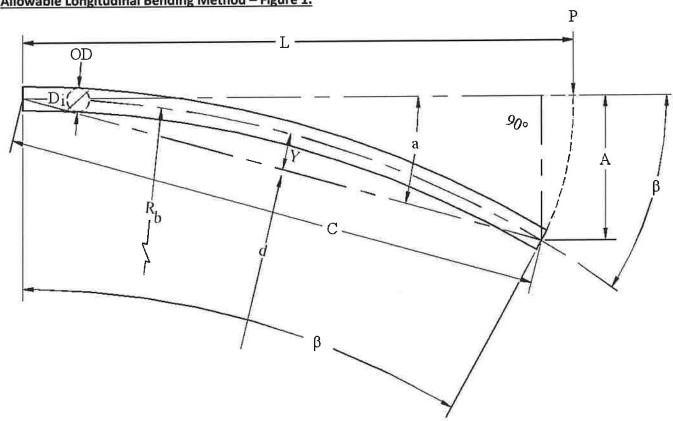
Longitudinal Bending Diagram is provided by the Uni-Bell PVC Pipe Association "Handbook of PVC Pipe Design and Construction".
